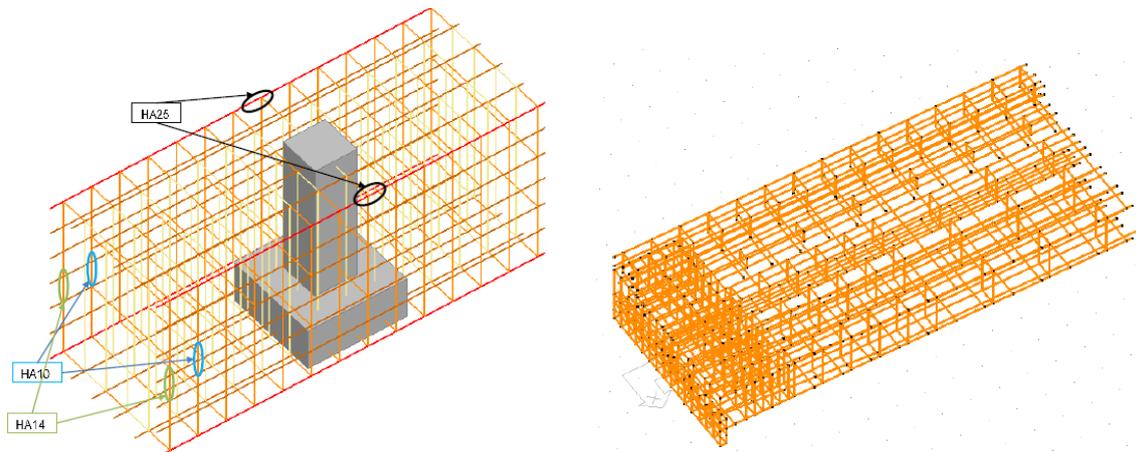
Illustration of the reinforcement inside the crossbeam (left) and inside the slab (right)
